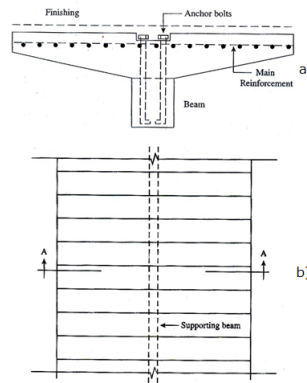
Precast cantilever stair supported by central beam (a)section A-A (b) Plan
